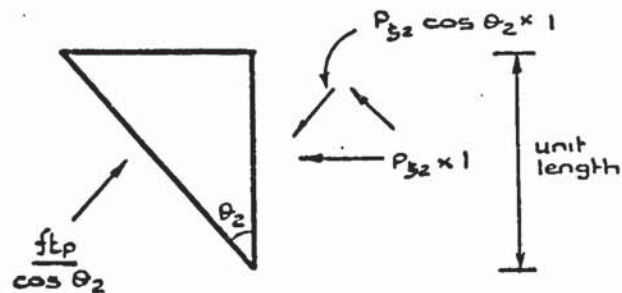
The forces due to prestress on an element of the concrete - Mode 2.
